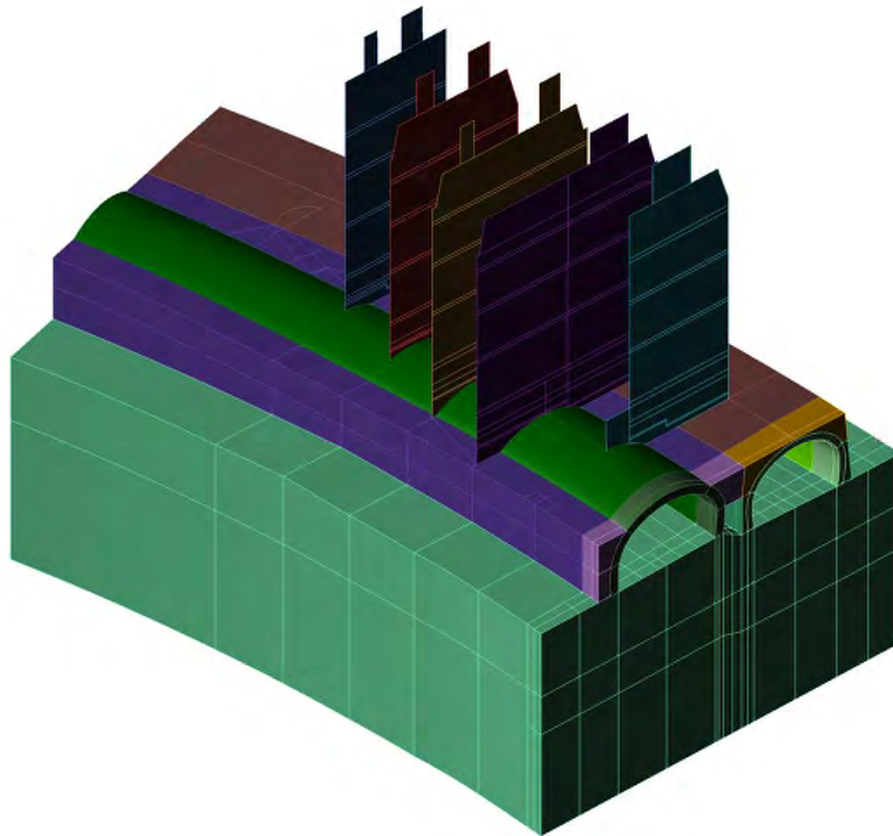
Geometric model of existing arrangement of tunnels and cross walls
